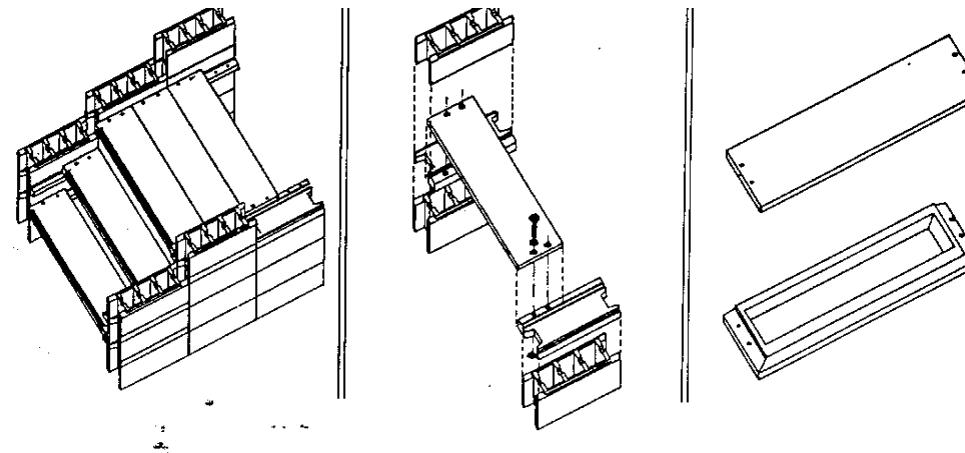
The Jordanian stair of Building System # 5 (RSC 1988)(6).
